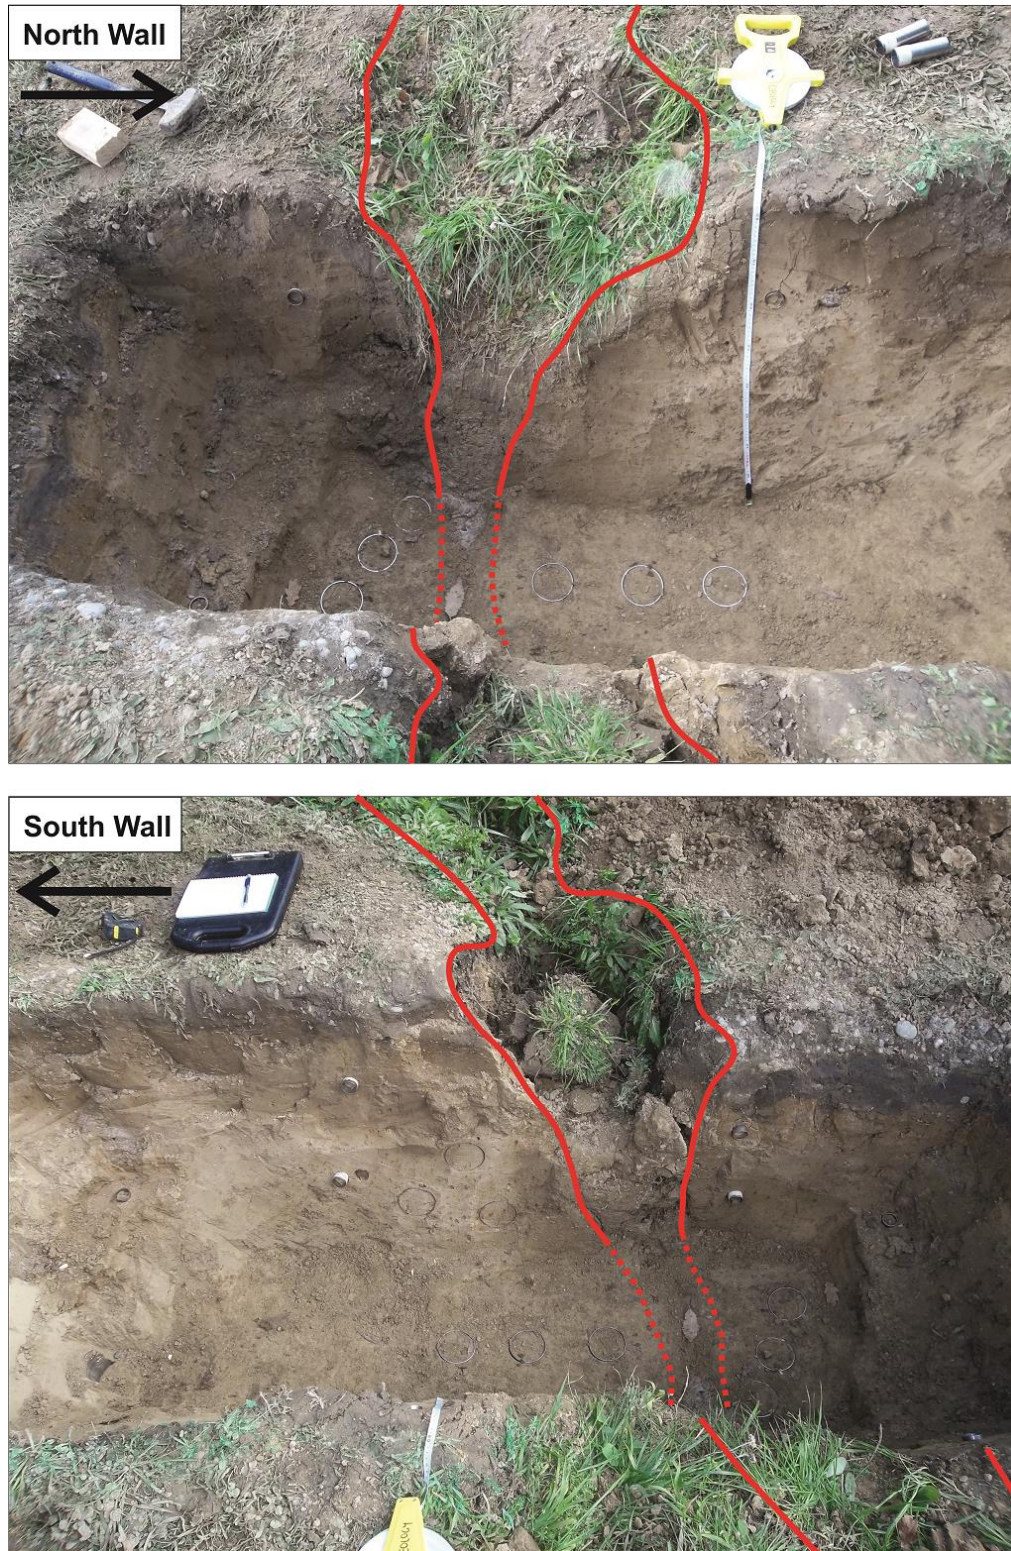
Trench walls. Fissure outlined by red and dashed along trench floor. Black arrow indicates upslope direction. Sample rings are 100mm in diameter, measuring tape on north wall reads 0.8m from the base of the excavation to ground level. Note seepage onto floor of trench from north wall fissure.
